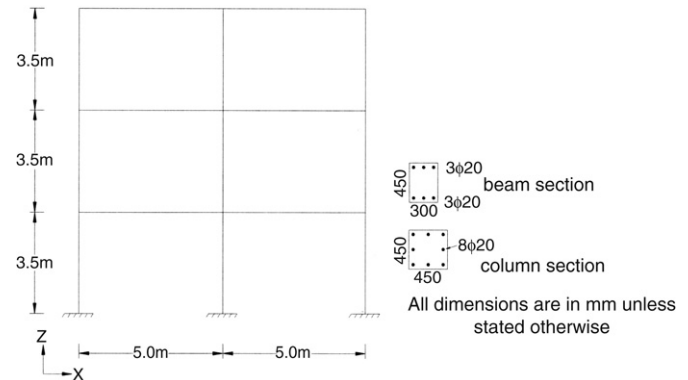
Elevation view and the details of the member cross-section details for uni-directionally eccentric system.
